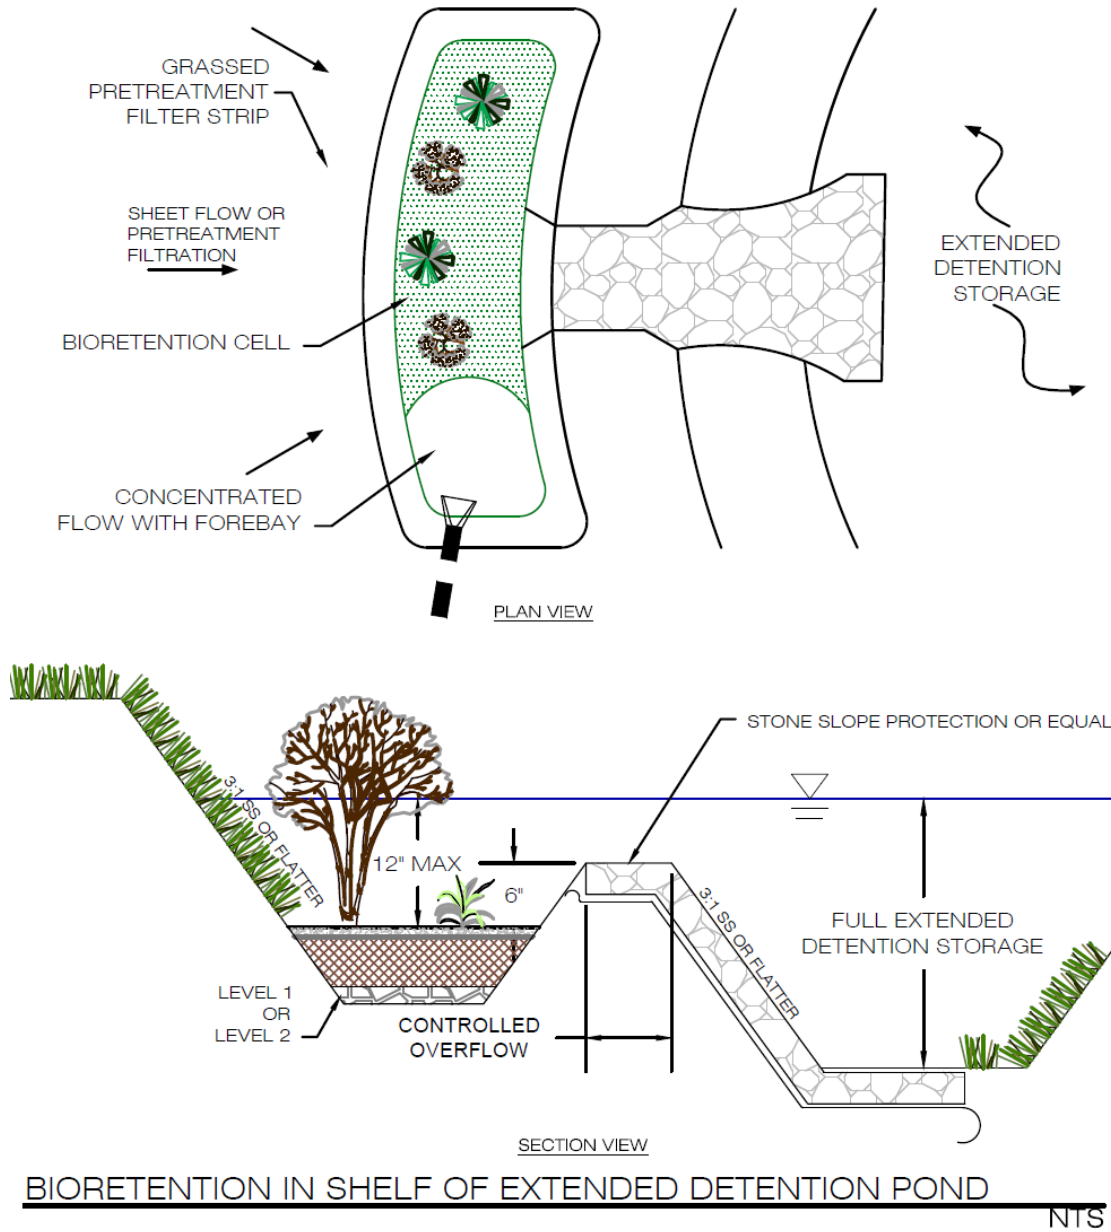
Typical Detail of a Bioretention Basin within the Upper Shelf of an ED Pond
